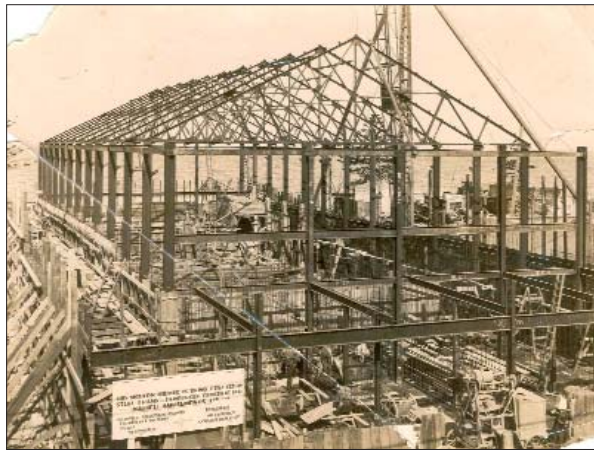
1932 construction of a Napier building having a riveted steel frame encased in concrete, during reconstruction following the 1931 Napier Earthquake (Credit: Fletcher Building Archives)
